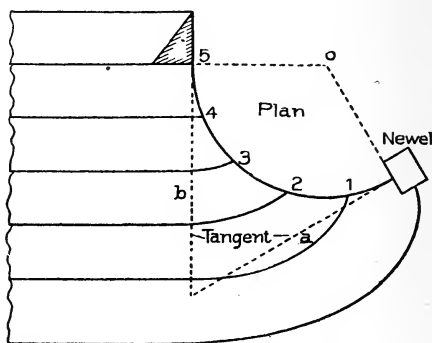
Plan of Curved Steps and Stringer at Bottom of Stair.
